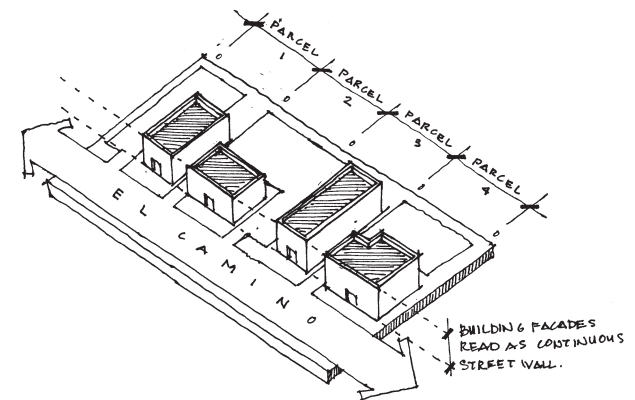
A row of buildings located at the setback line helps create a street wall which defines the space of the street.
